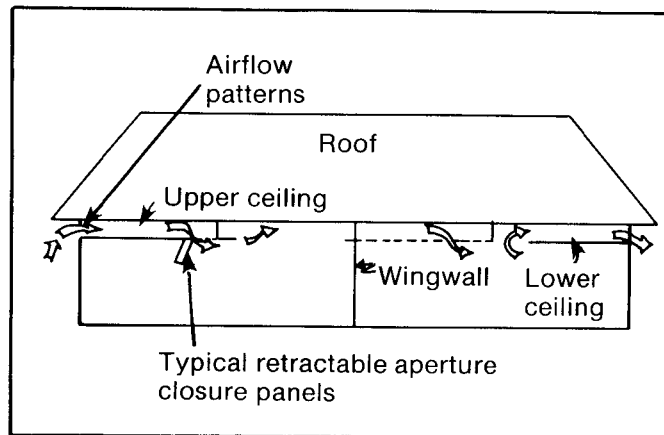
Elevation View of Windowless Double-Ceiling Ventilator
